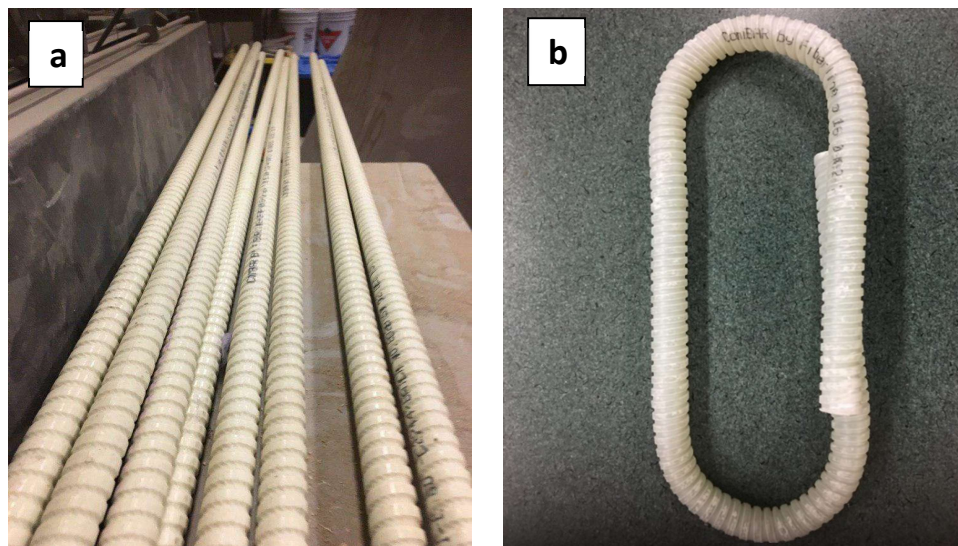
GFRP Bars: (a) Longitudinal Reinforcement (b) Stirrup
